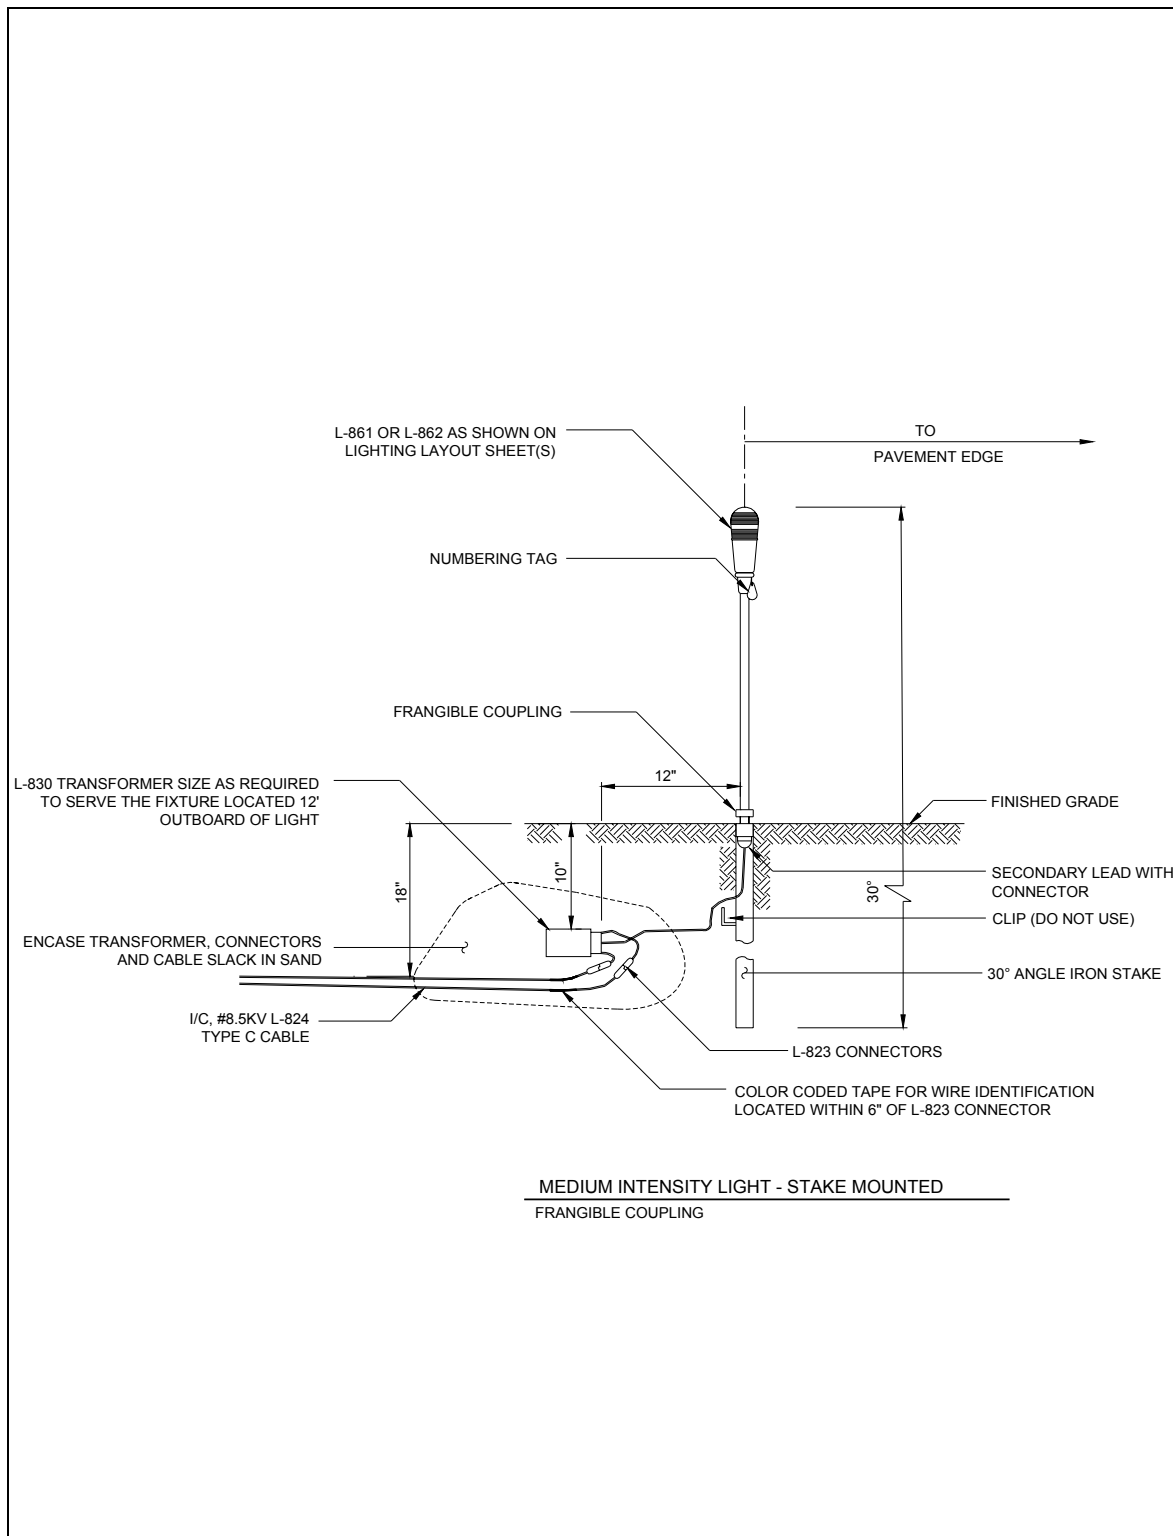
Typical Standard Details for Runway & Taxiway Edge Lights – GL-600 Sheet 1C – Medium Intensity Light – Stake Mounted
